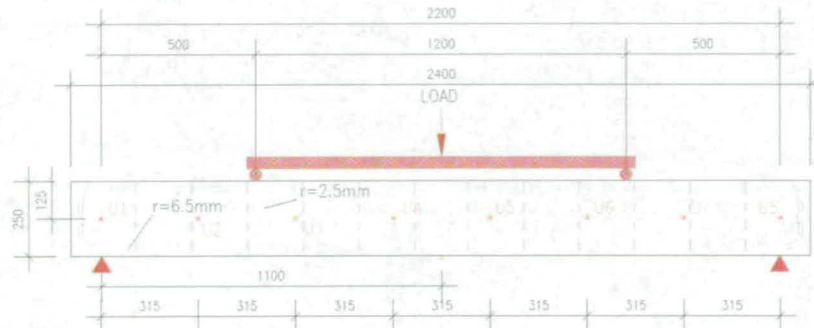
Design details, test configuration and broadband sensor location (UT-1000 type: U1 to U8) of beam K3.
